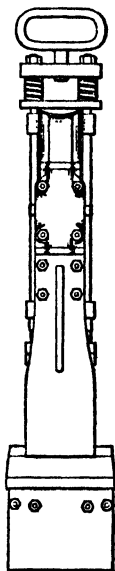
Small Power-hammer for Driving Sheetting Planks
